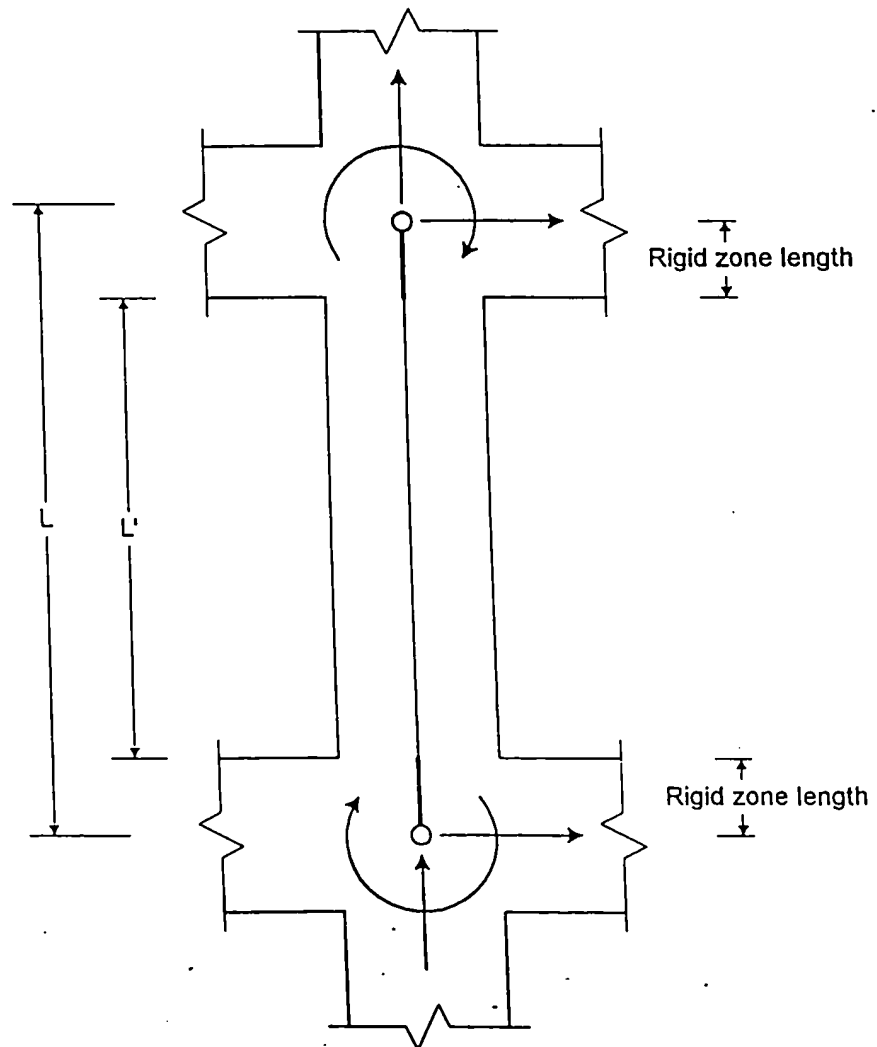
Typical column element and degrees of freedom (Aly, 1997)
